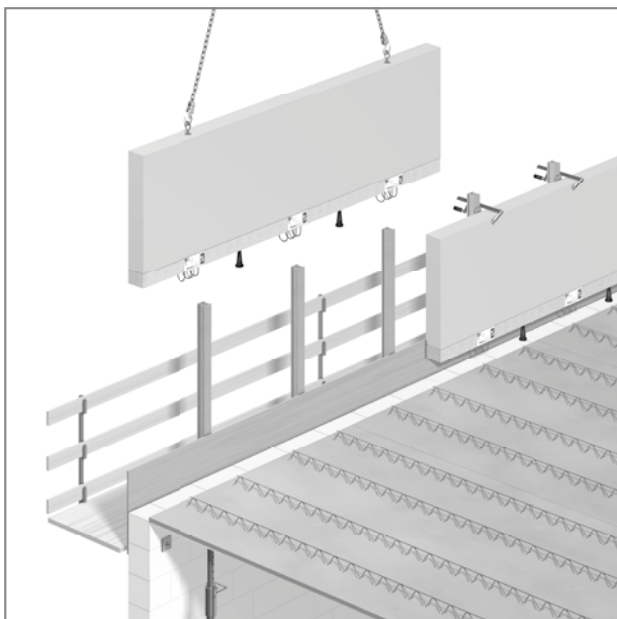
Schöck Isokorb® XT type A with Combar® FT erection support: Hoisting of the prefabricated attic
